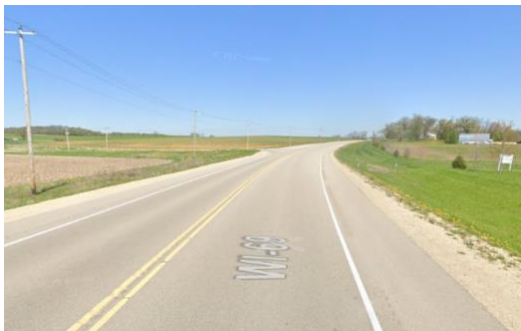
Open-Road Test Sections on STH 69 Post Reconstruction (May 2025)
